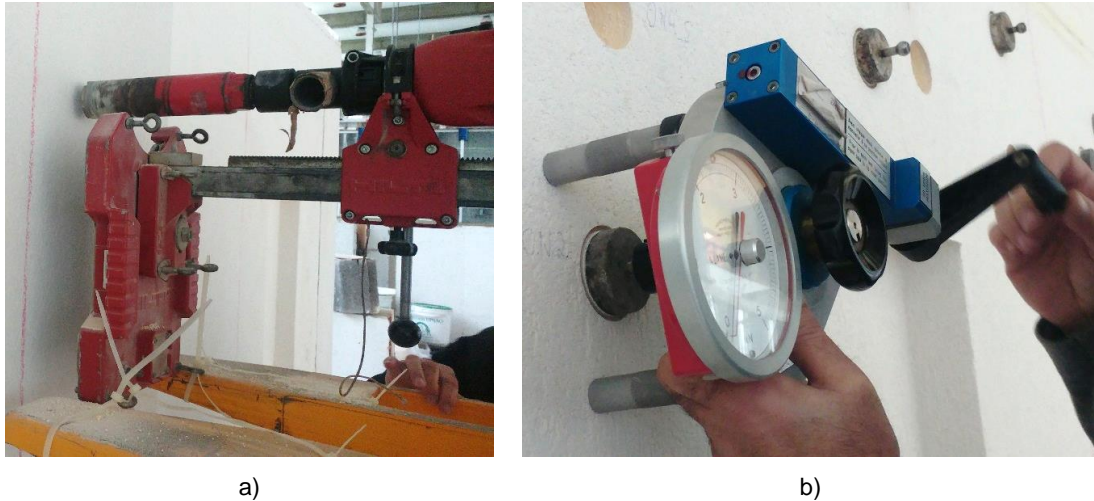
Adhesive strength test apparatus: a) Core drilling machine; b) Testing machine.
